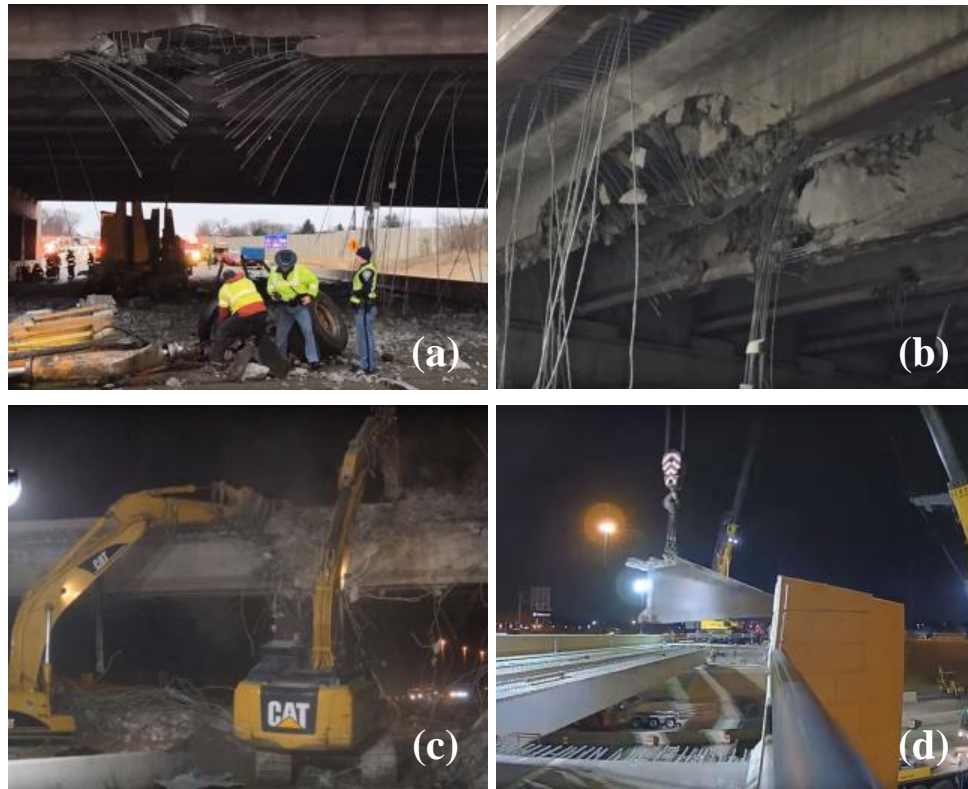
Impact Damaged, Prestressed Concrete Bridge (Greenizan, 2017)
